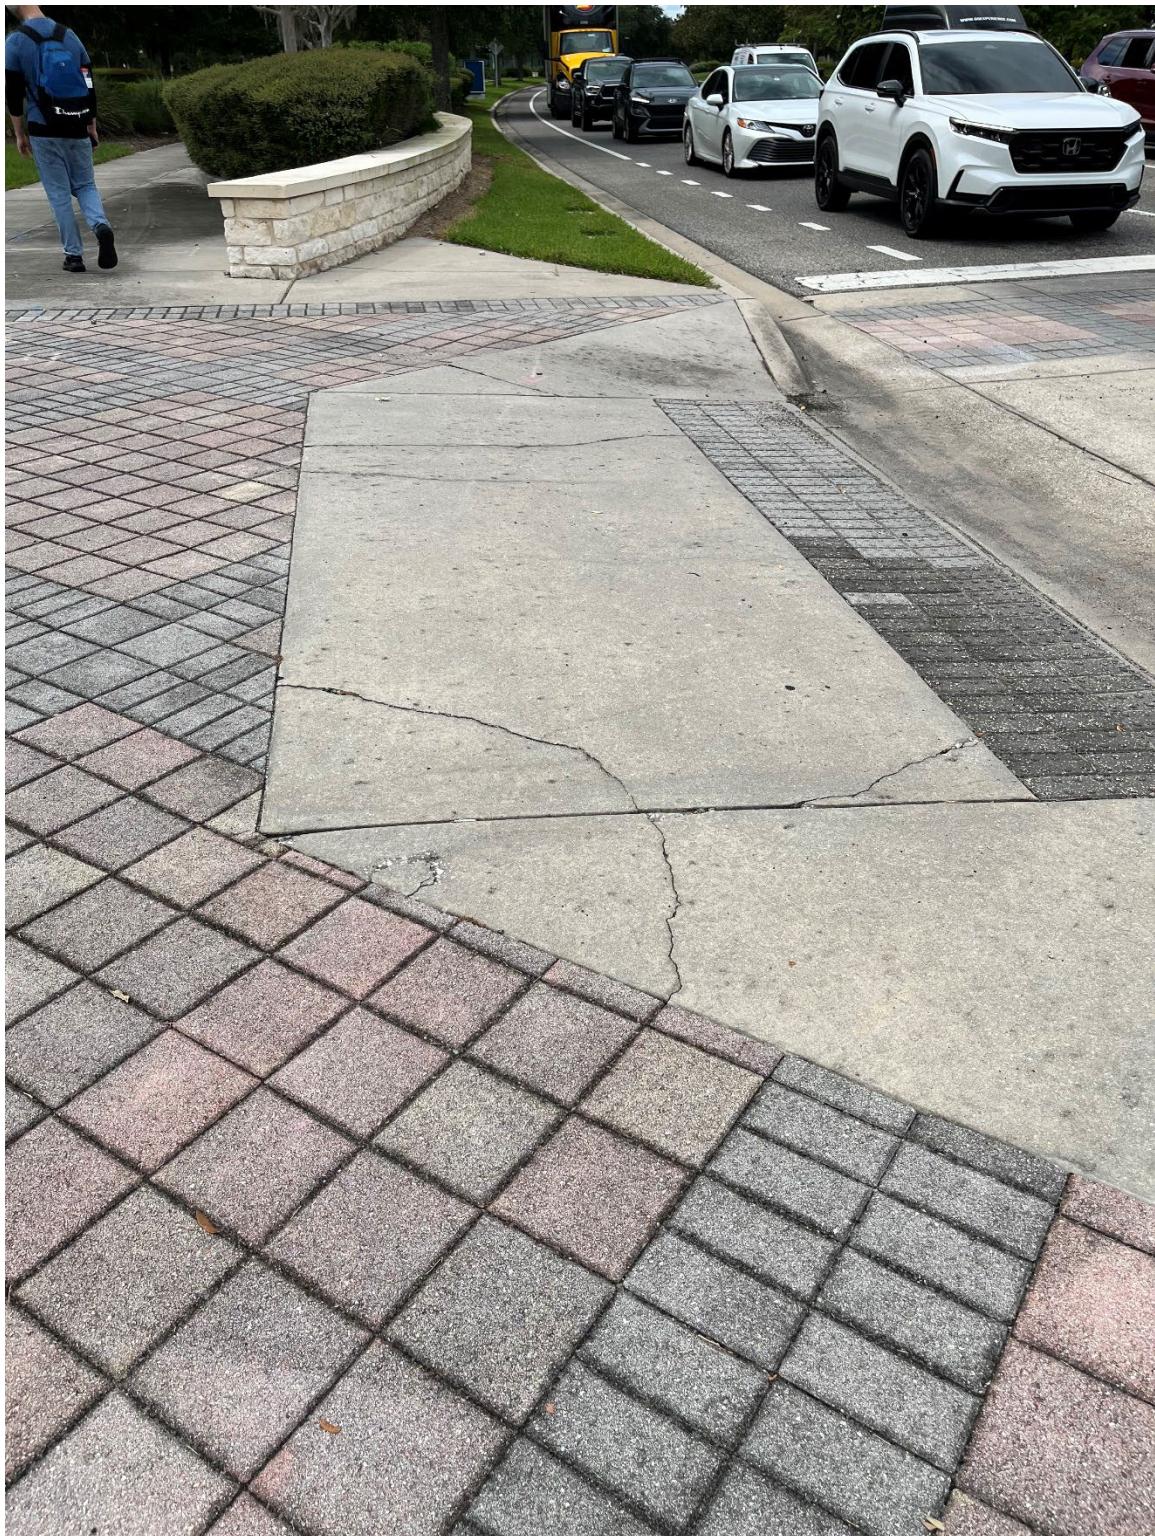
Surficial Concrete Cracks in Handicap Ramp
